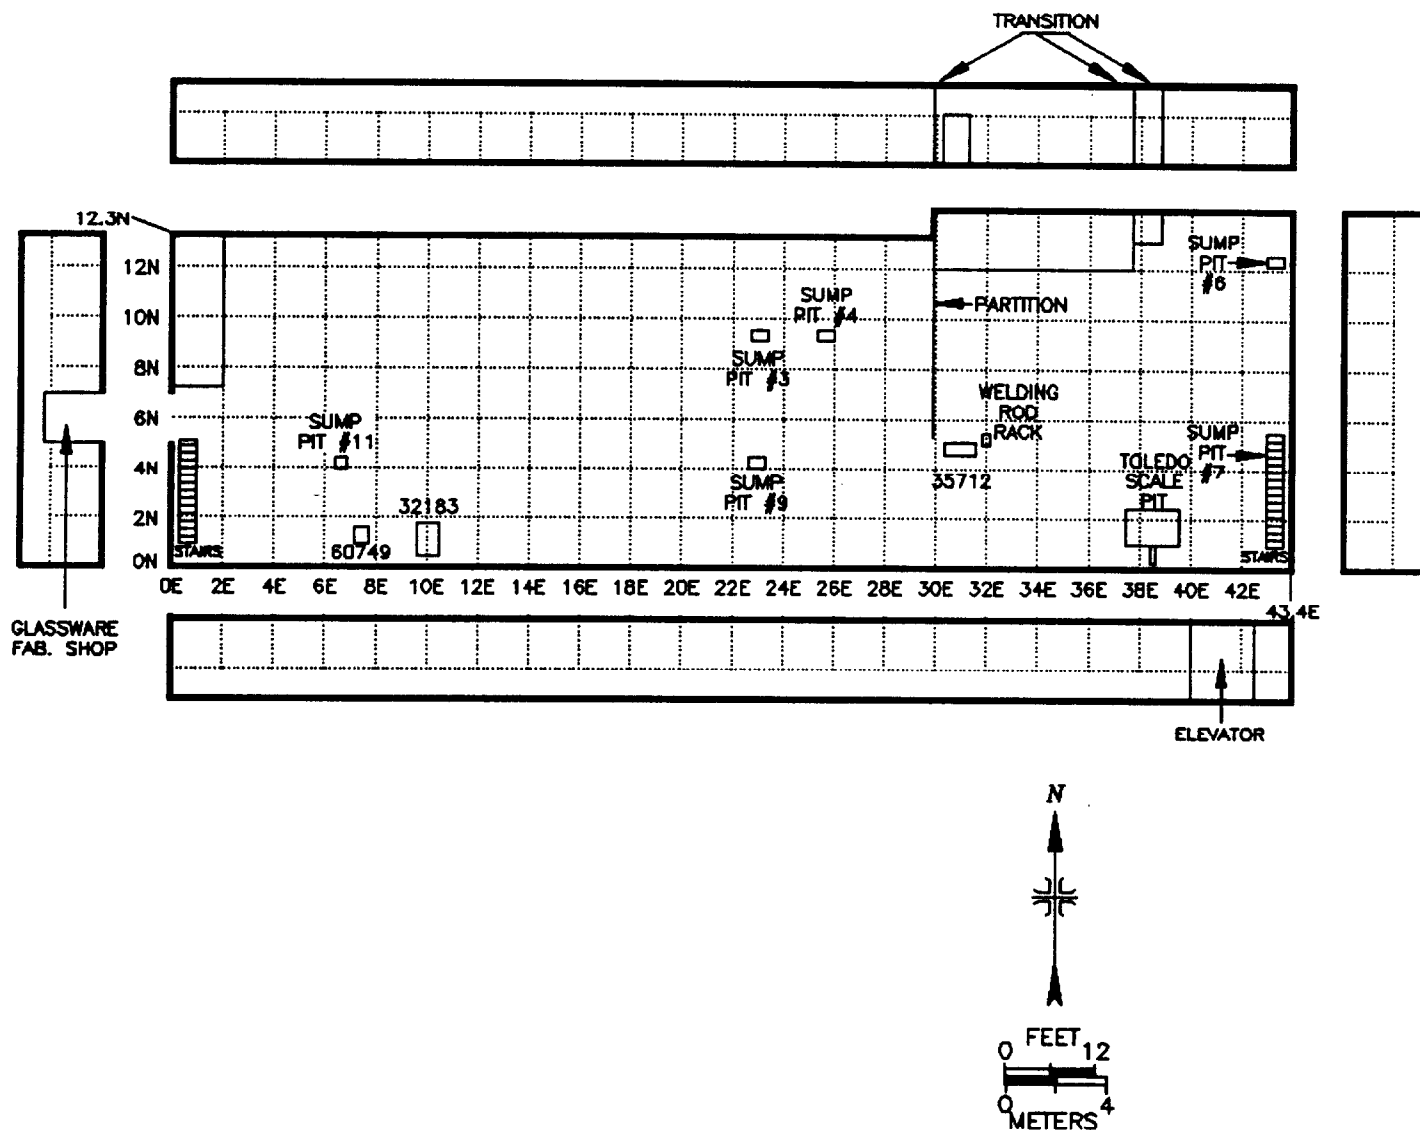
Building 28, Basement Plot Plan – Reference Grid and Sump Locations
